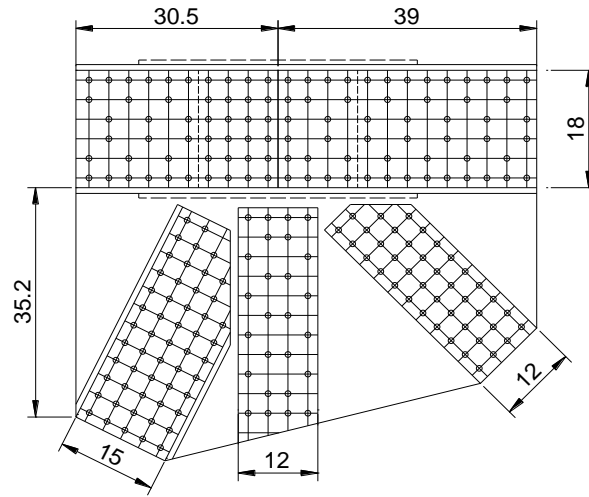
Typical joint configuration (Case P5-C-WV-NP, all dimensions are in inches)
